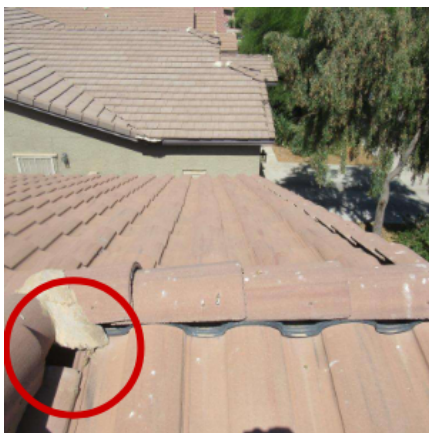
Roof tile has slid out of place - NE Corner of Home
